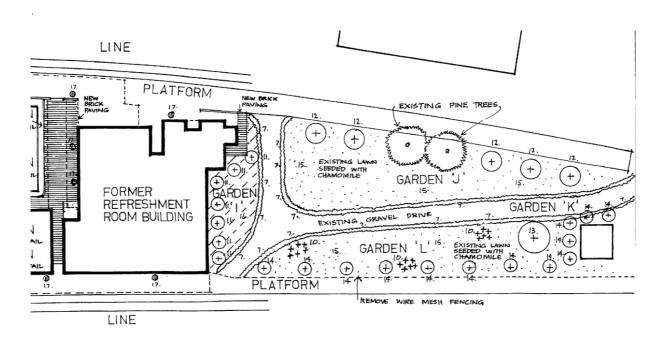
Extract of proposed 1986 landscape design plans showing planting schedule in the Refreshment Rooms Garden remodel. (Source: ARHS)
